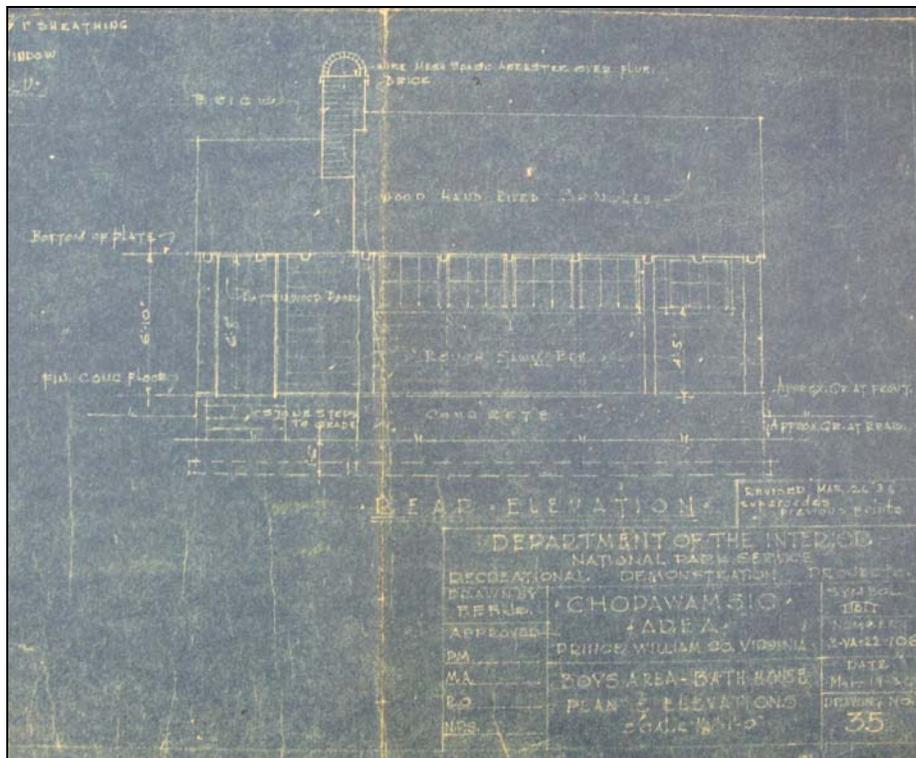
South Elevation from Camp 1 Central Bath House Blueprint, 1936.
